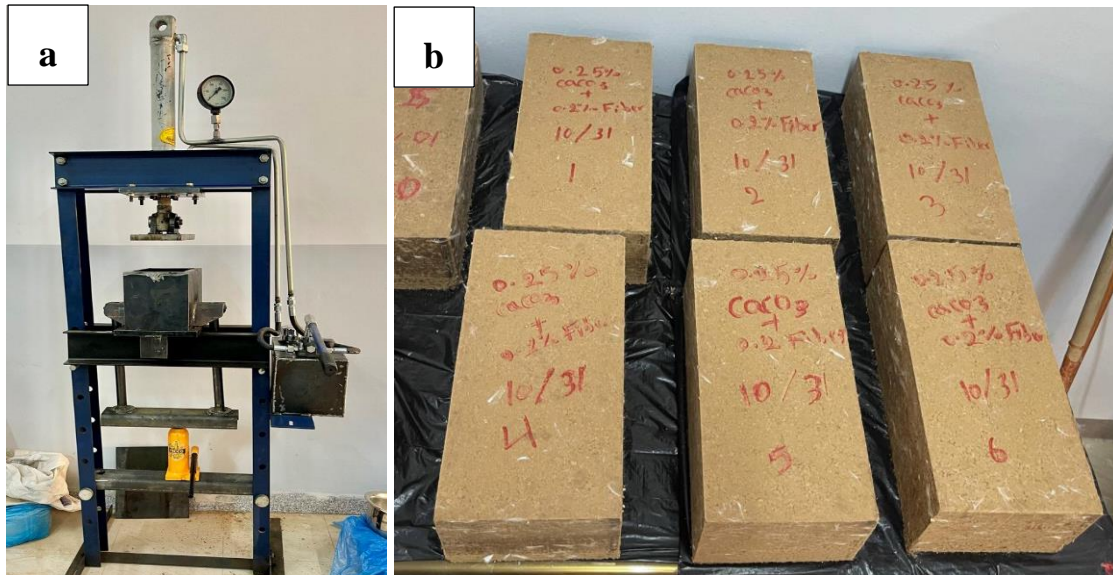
(a) Pressing machine, (b) Large-scale compressed block specimens.
